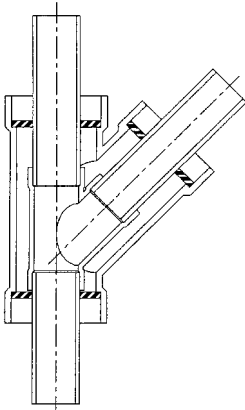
Example of thermoplastic 45° lateral (wye) using molded code approved carrier fitting. (*Orion Fittings, Inc.*)
